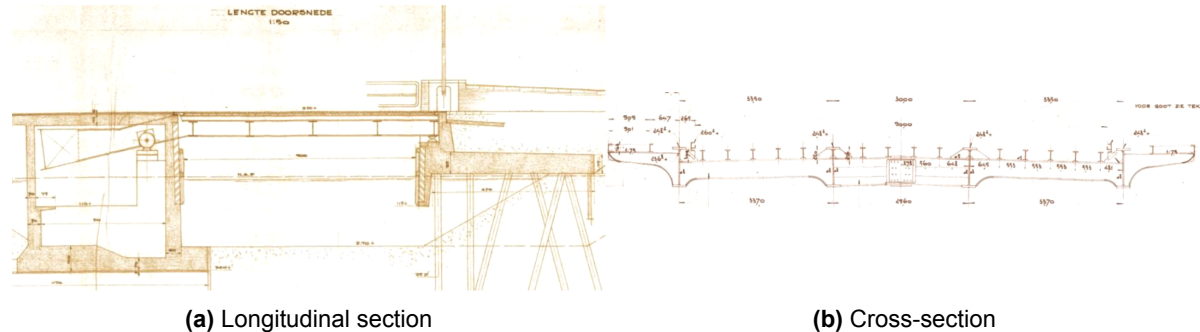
Technical drawings of the Kwekersbrug [ref?]
